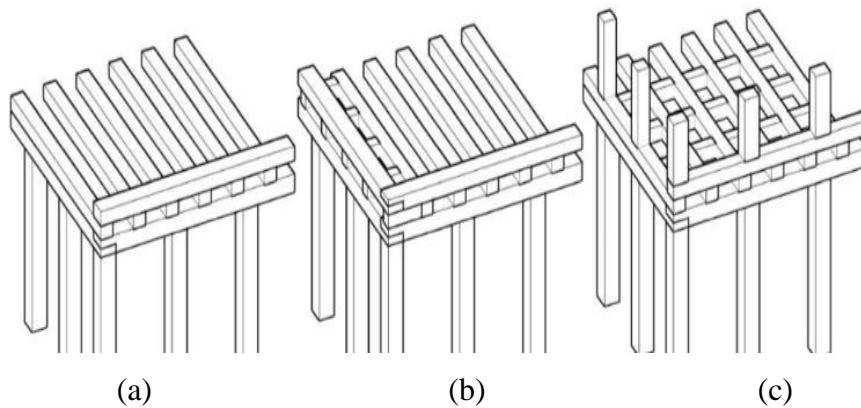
3:Traditional Turkish wooden slabs. Double plates with one-way (a), single slab (b) and two-way slabs (c) using double plates
